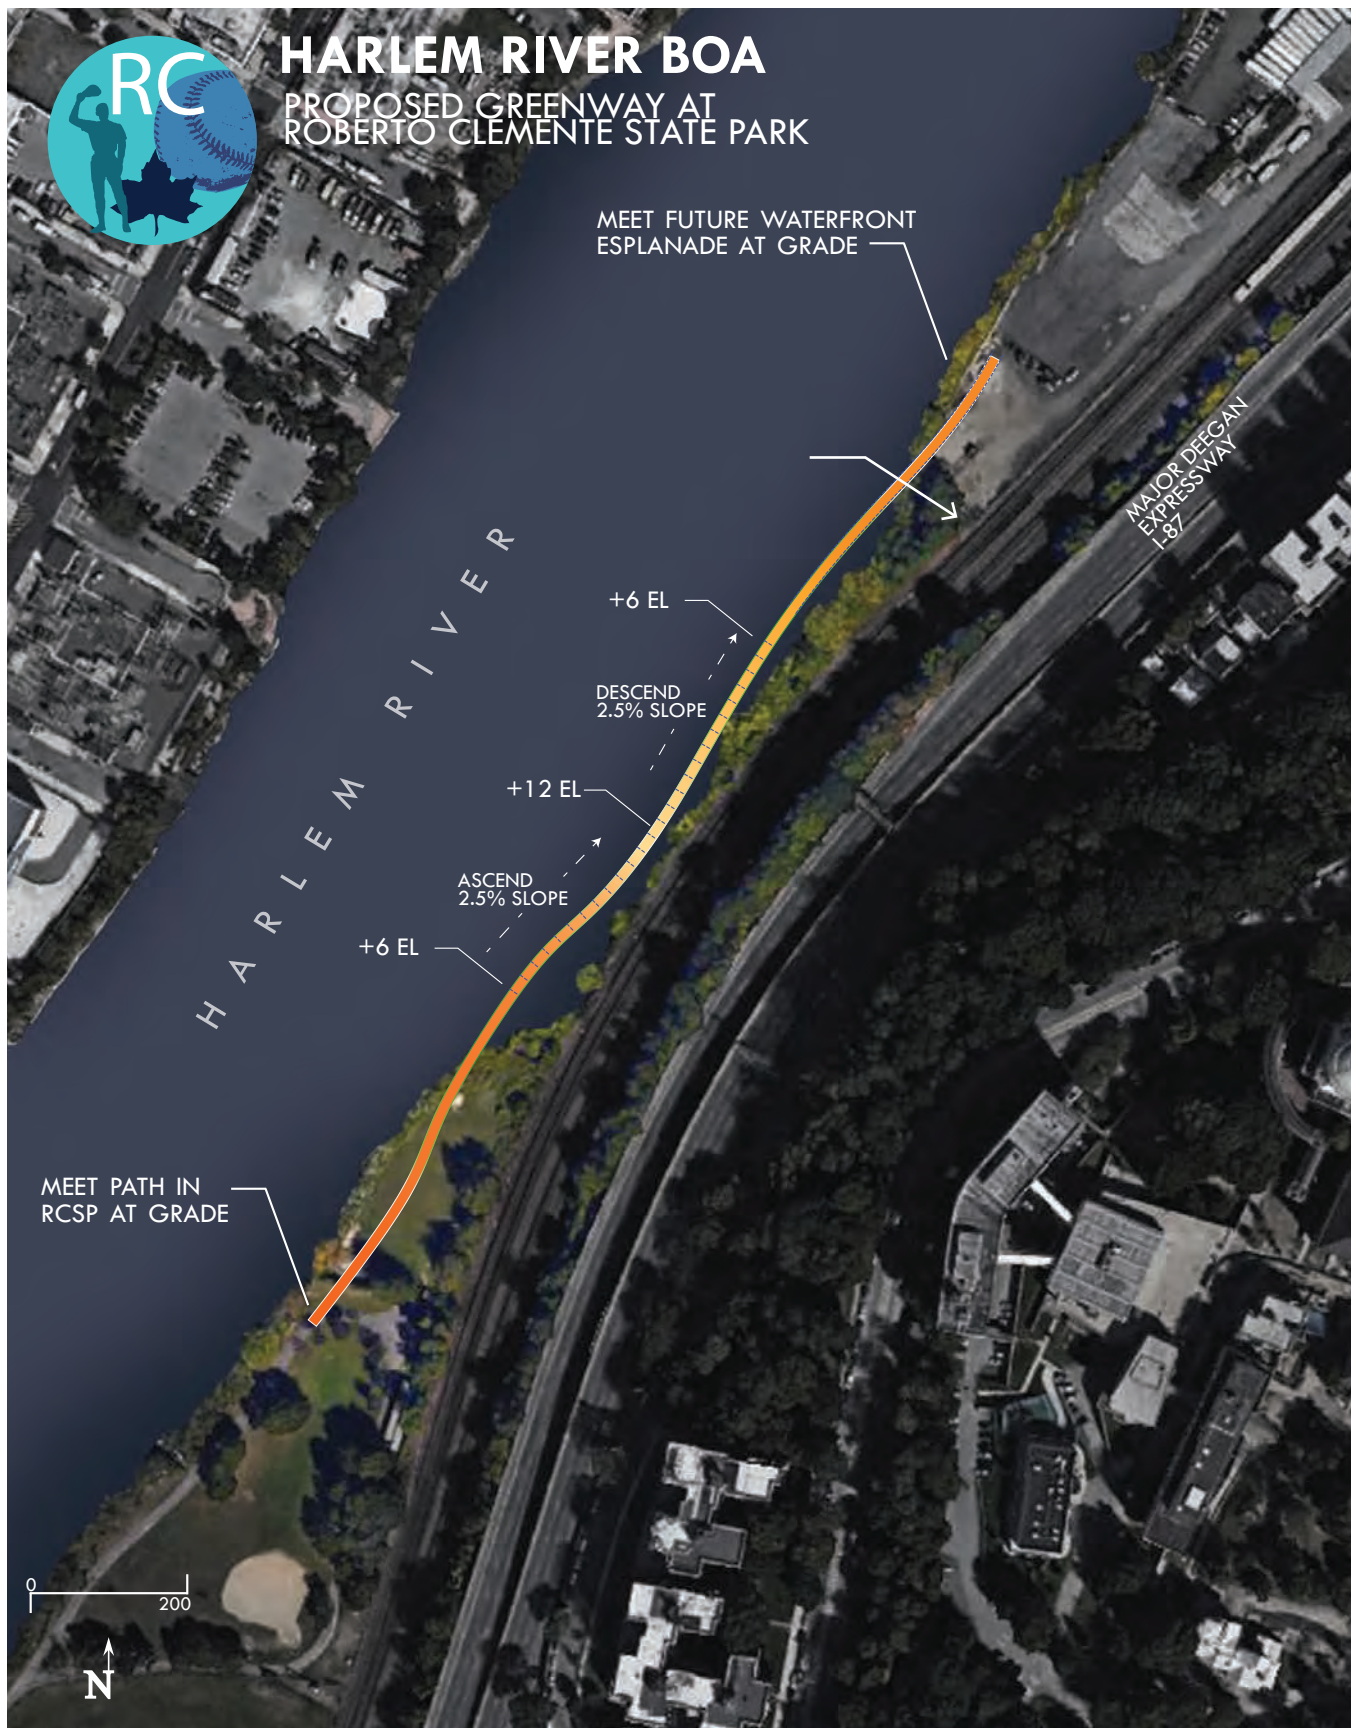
Concept Plan: Proposed Greenway Connection at Strategic Site #5, North of RCSP
